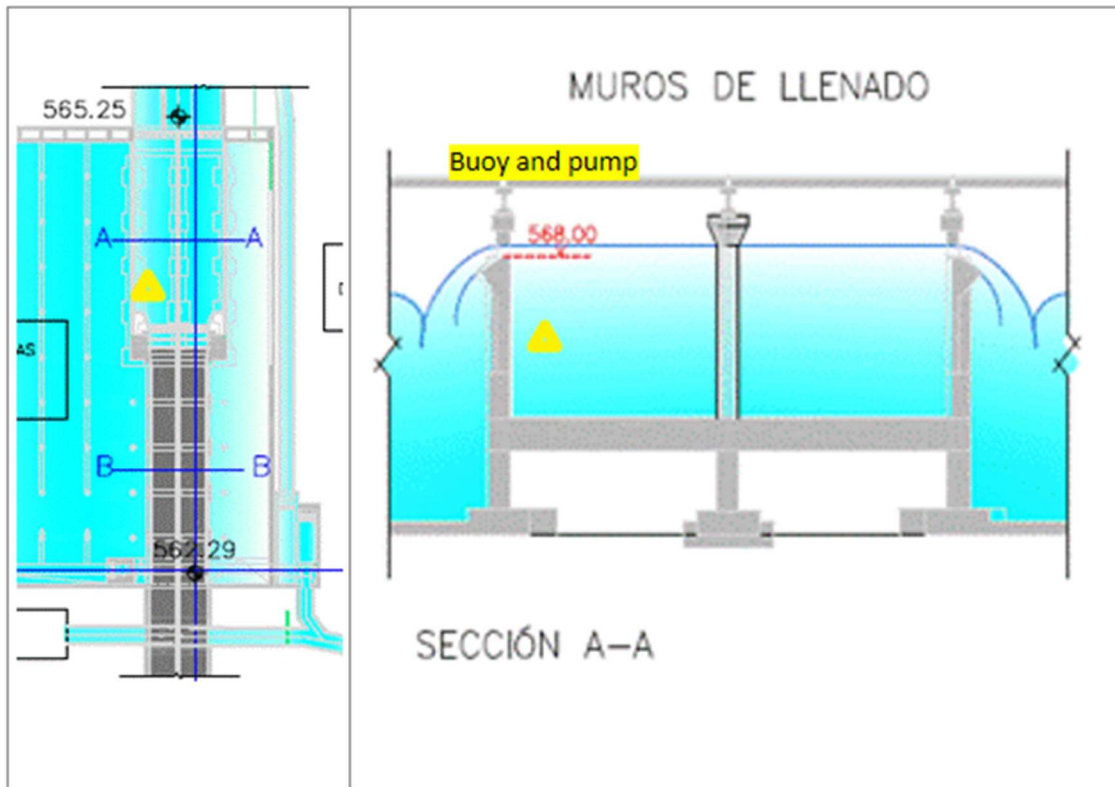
Buoy and pump location in Butarque tank horizontal and cross section plan
